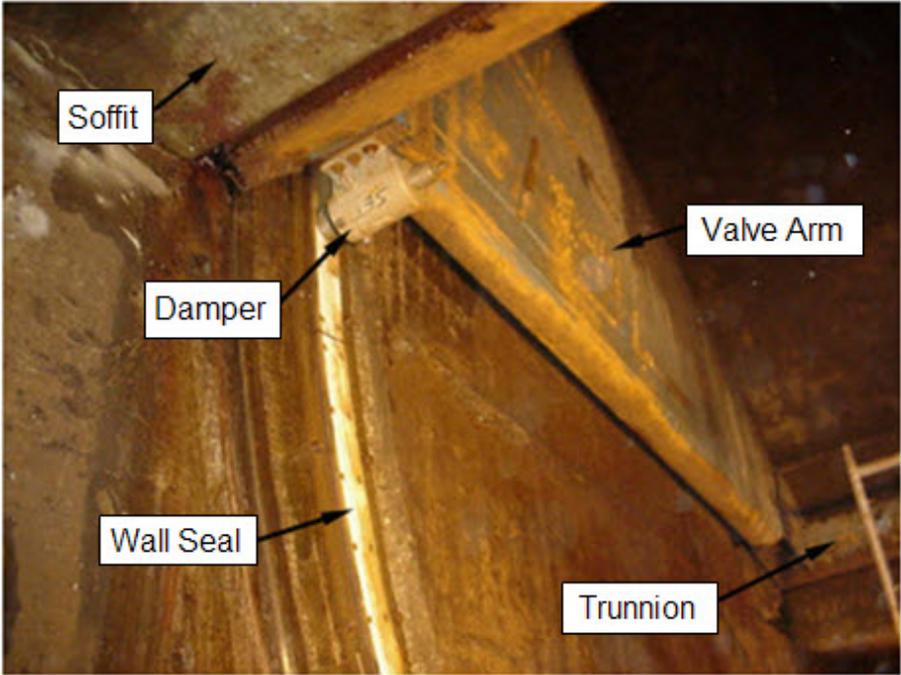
Damper attached to bottom of valve arm, Eisenhower and Snell Locks.
